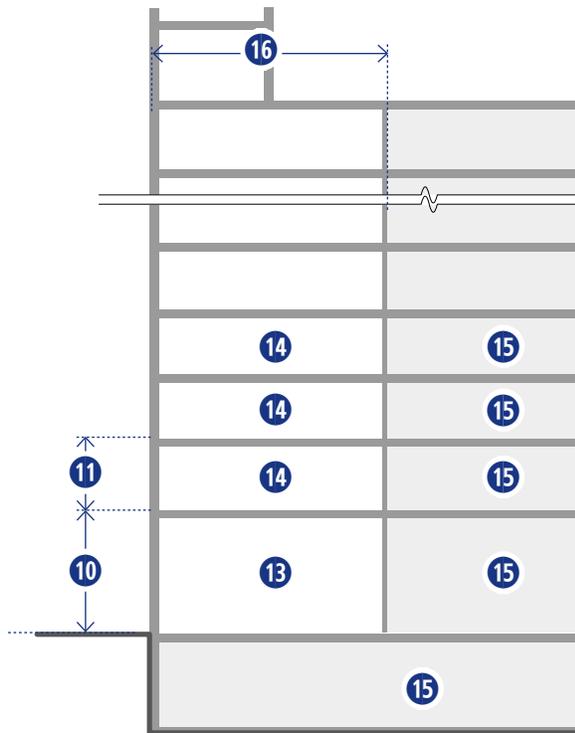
Shopfront Building: Floor-to-Floor Height & Use Requirements
